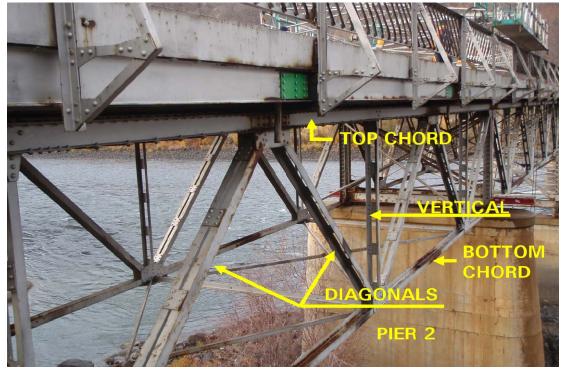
View of Typical Truss Span Showing Vertical Load Carrying Members
